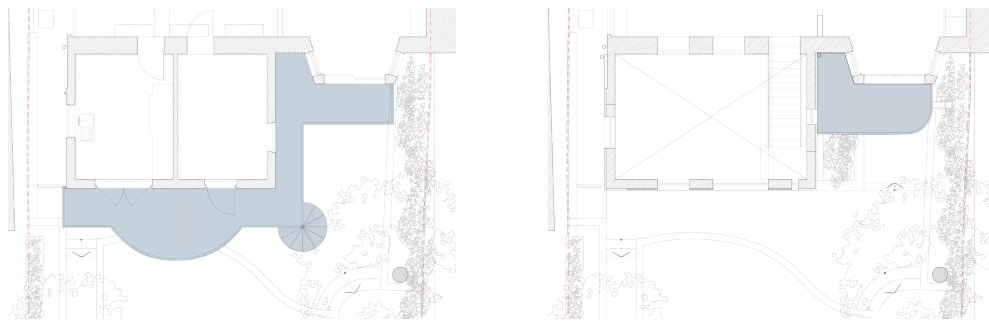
Left: Existing balcony footprint; Right: Proposed balcony footprint.
